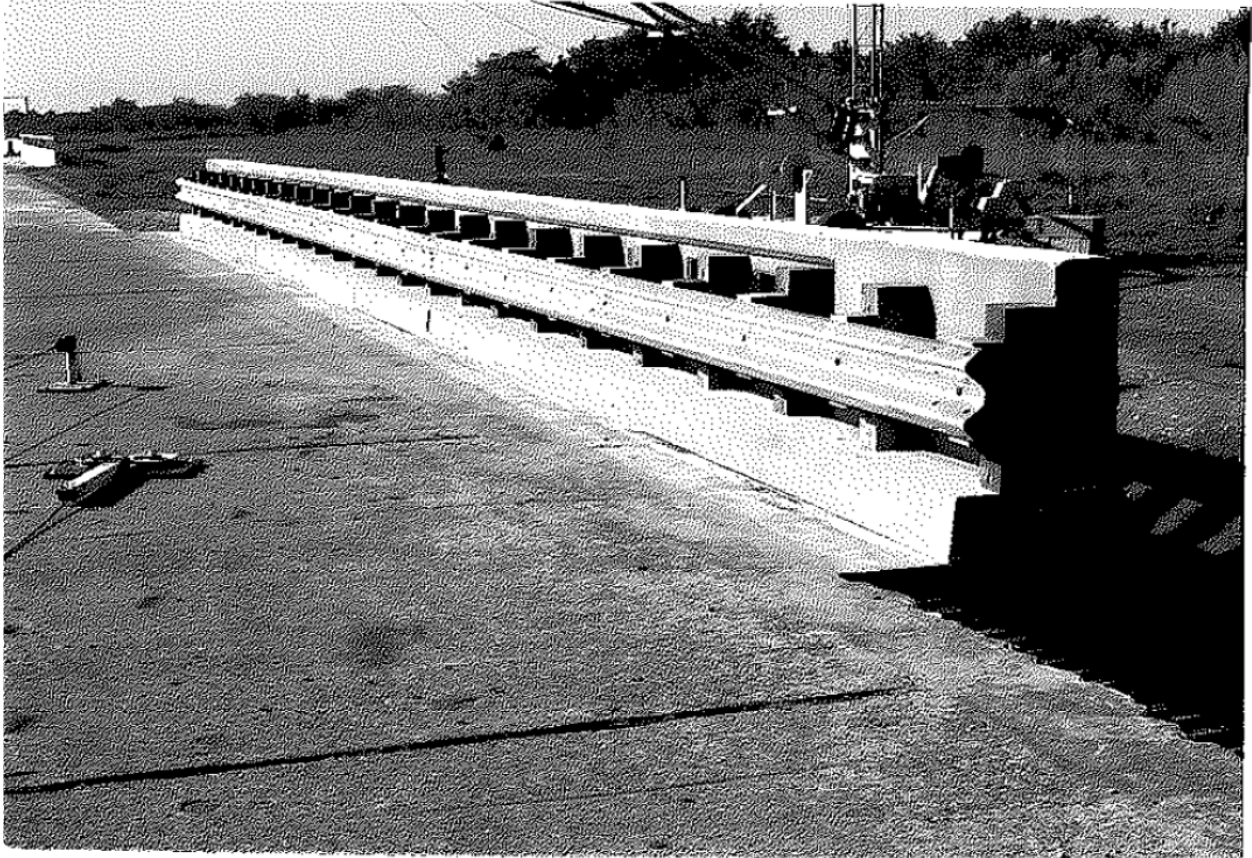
Photograph of Traffic Side View of Concrete Rail Retrofit Project No. 472070
